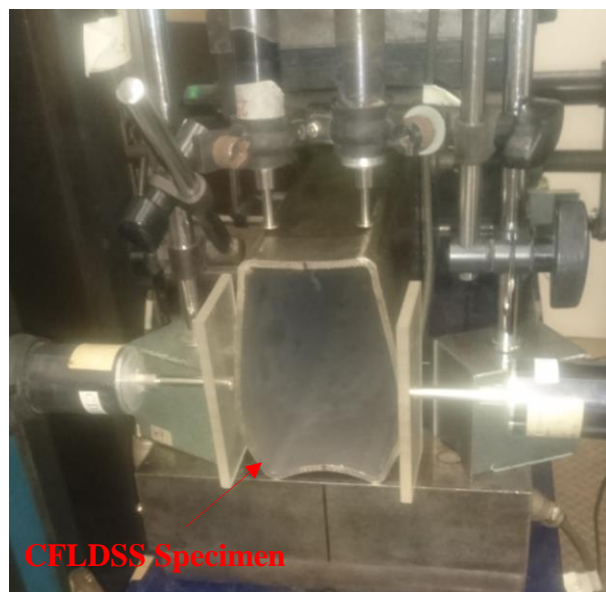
Web crippling failure of Specimen EOF120×60×3.0N60 (a) Failure at specimen end in test
